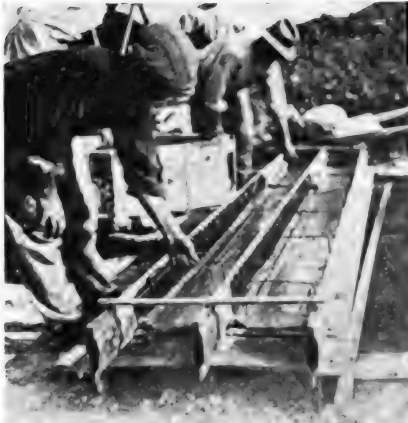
PLACING FIRST LAYER OF CONCRETE IN FLOOR BEAMS.
